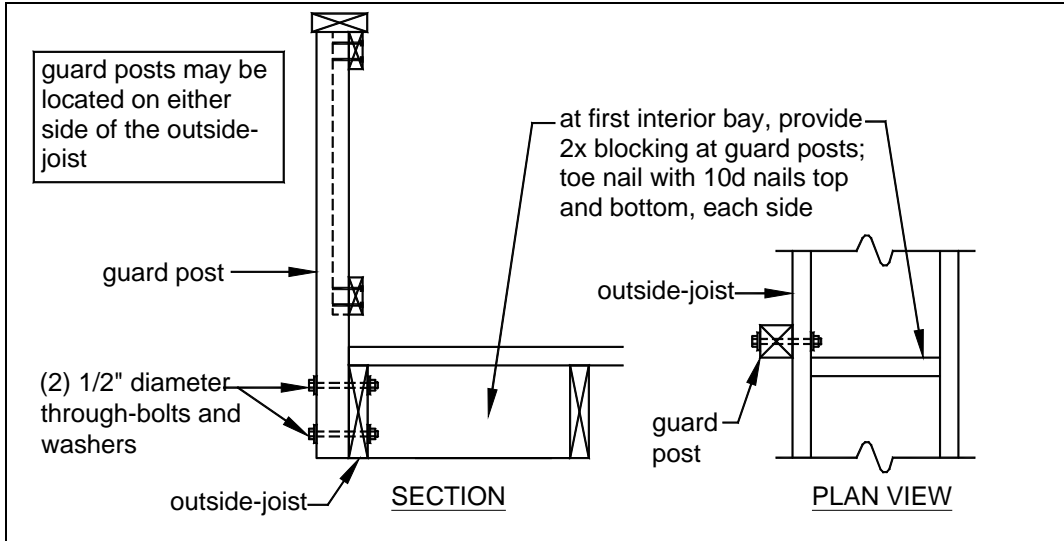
GUARD POST TO OUTSIDE JOIST DETAIL
